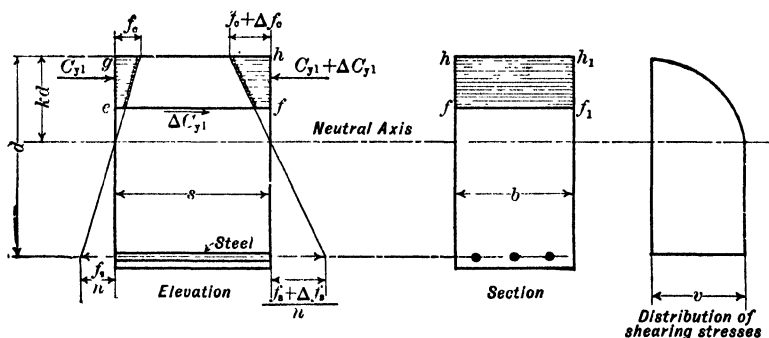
Horizontal and Vertical Shearing Stresses in Beam. (See p. 368.)
